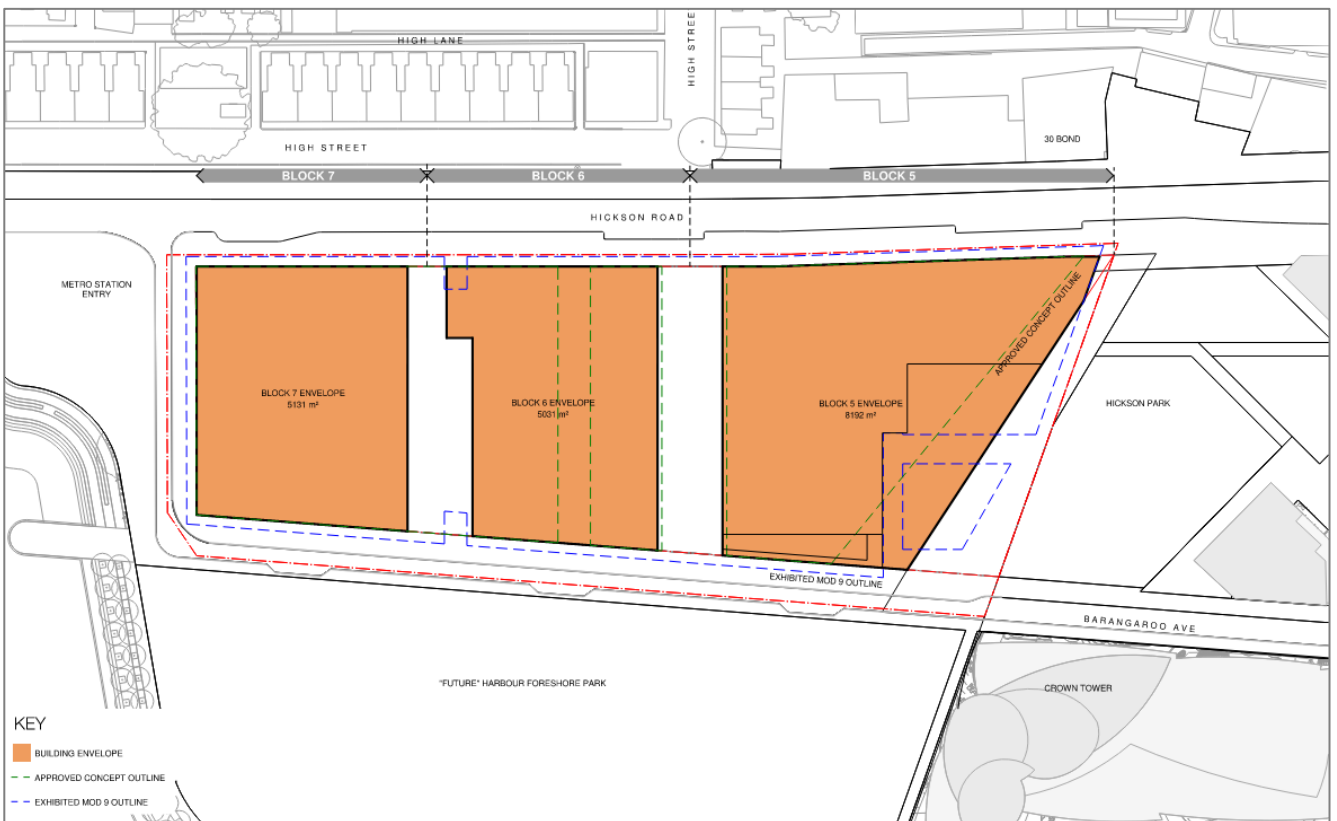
AMENDED CONCEPT BUILDING ENVELOPE (SJB)
